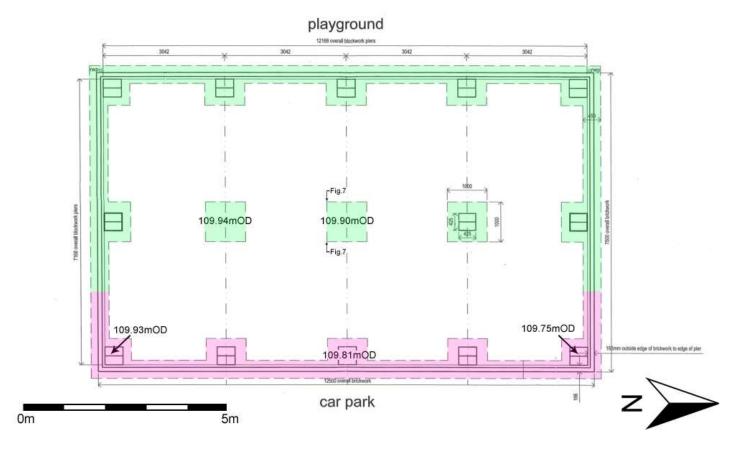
Plan of footings observed on the 19.02.15, (green), and 23.02.15, (pink)
